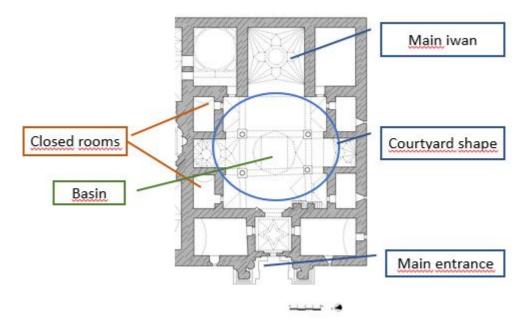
Divrigi Hospital (Cantay, 1992, plan 4)
